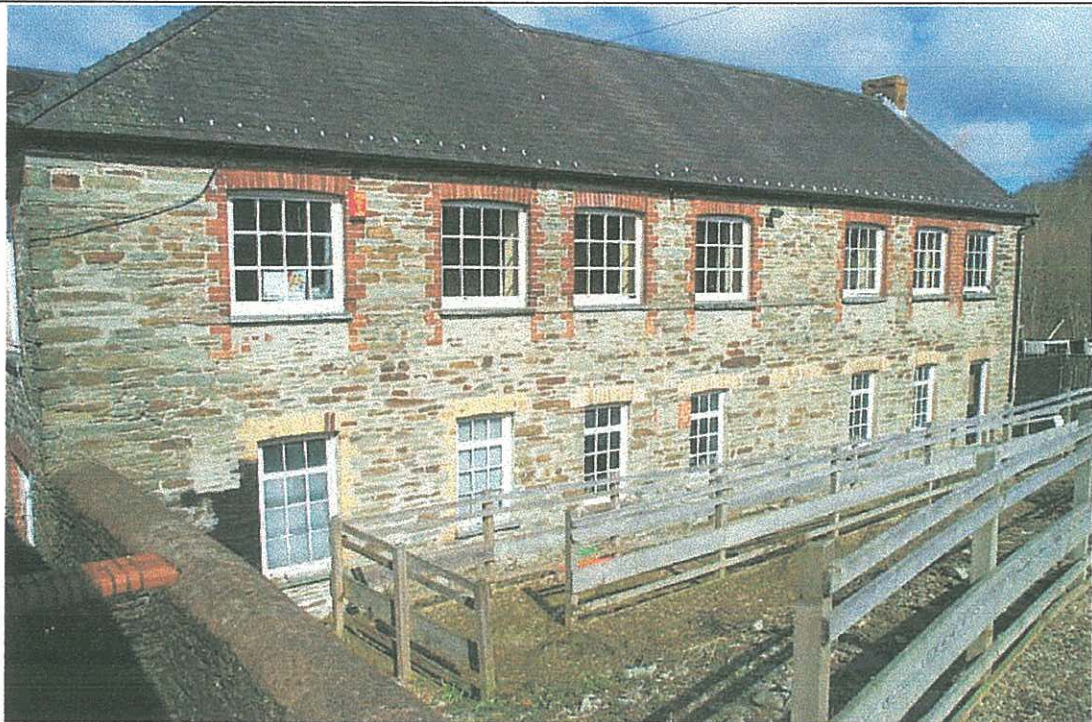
General view of southeast wall. Note the different colour brick window surrounds and the roof scar, at upper sill level, of the former gas-plant.
